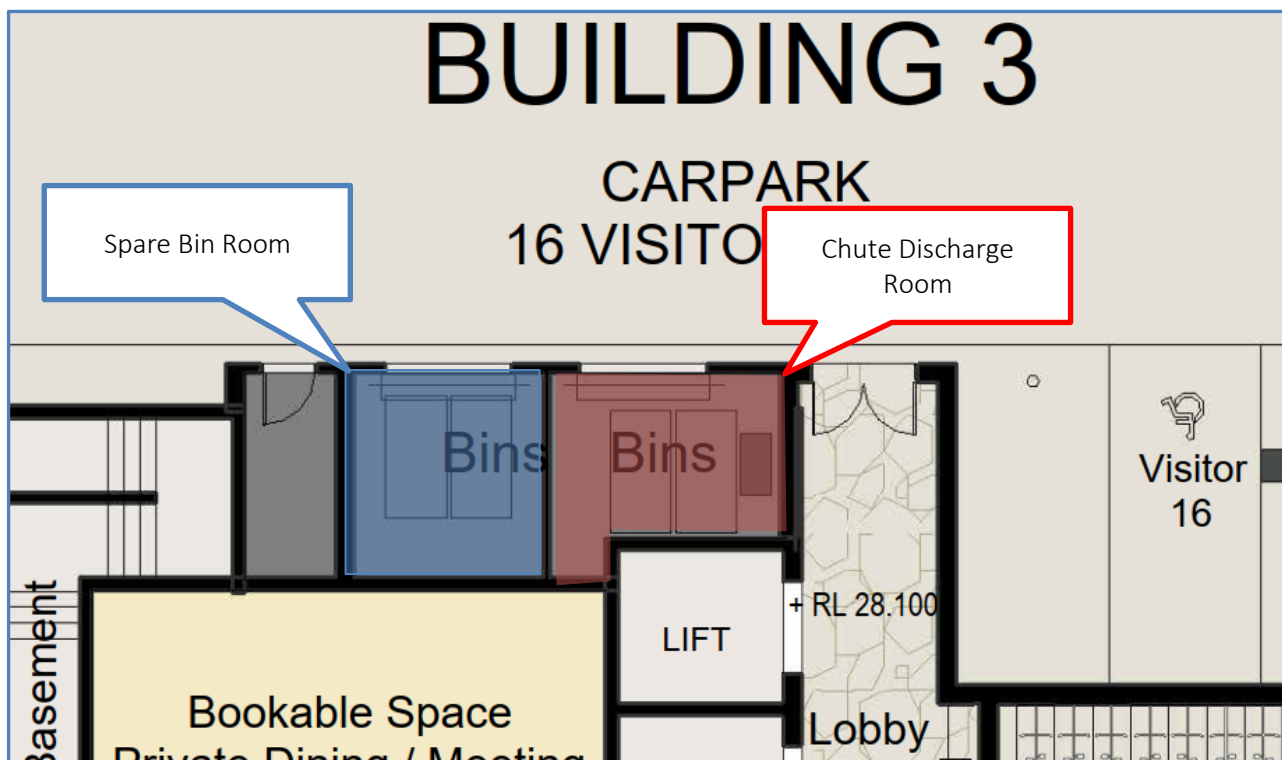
Chute Discharge Room & Spare Bin Room (Building 3)
